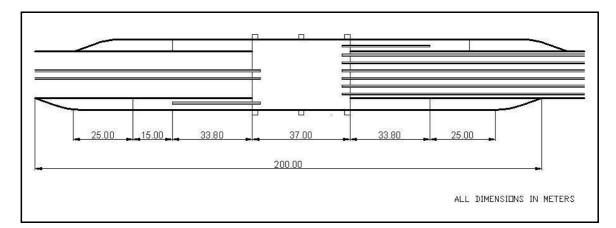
Top View Crossing Junction Switch Dimensions
